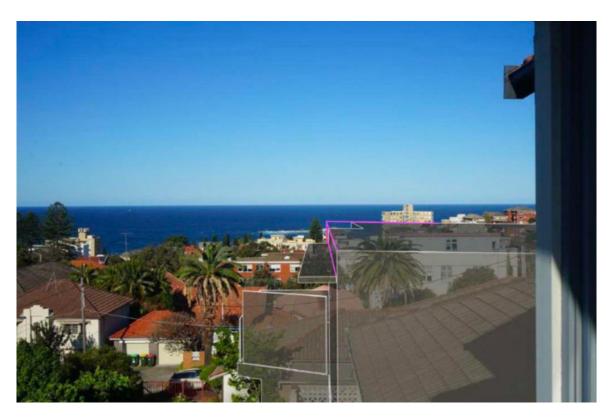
View impact from the rear balcony with the final version of plans, Revision F.
